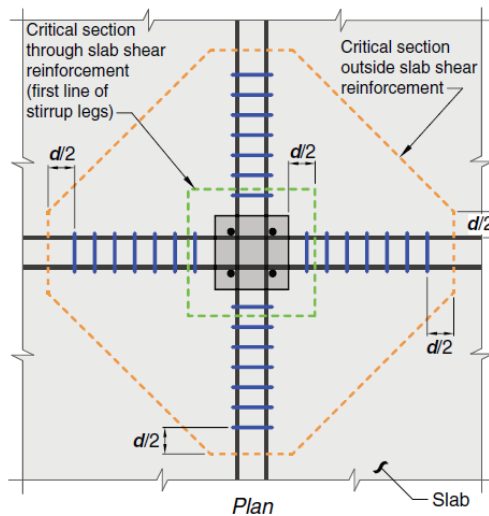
Critical sections for two-way shear in slab with shear reinforcement at interior column (ACI Committee 318, 2019)
